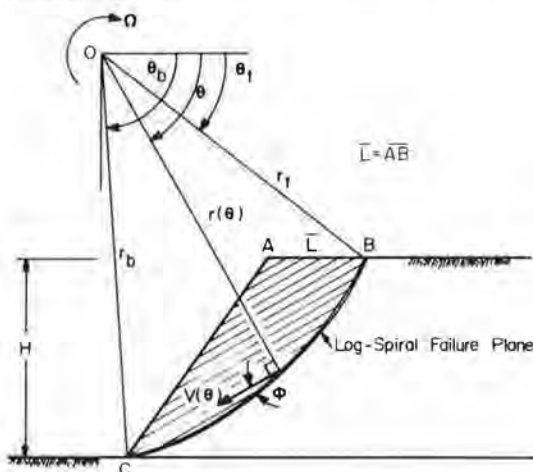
Failure mechanism for stability of embankment with failure plane passing through toe.
